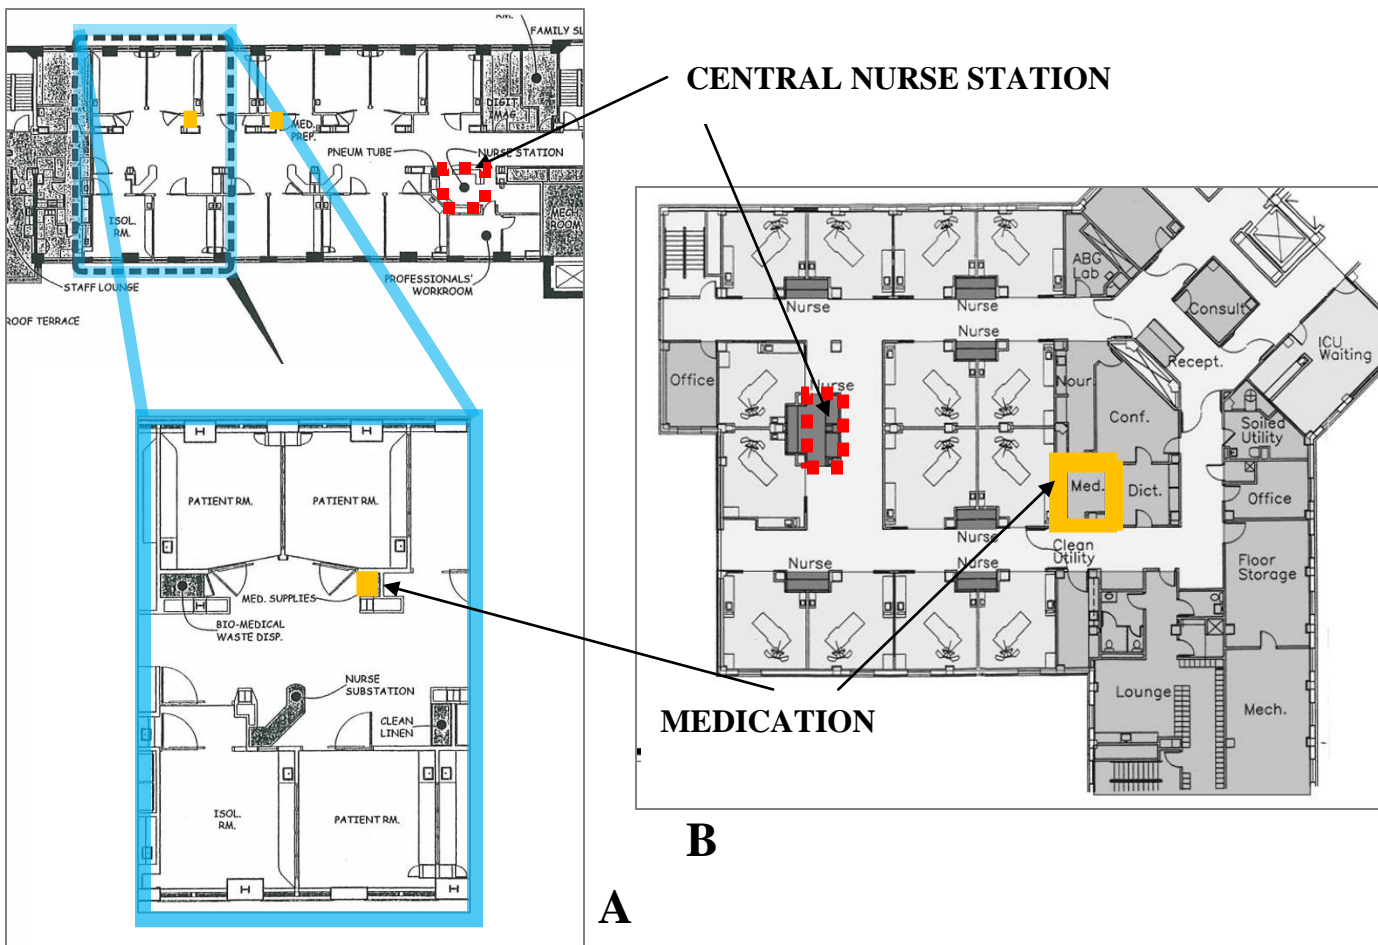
Floor Plan Examples: Medication Away from Nurse Station
